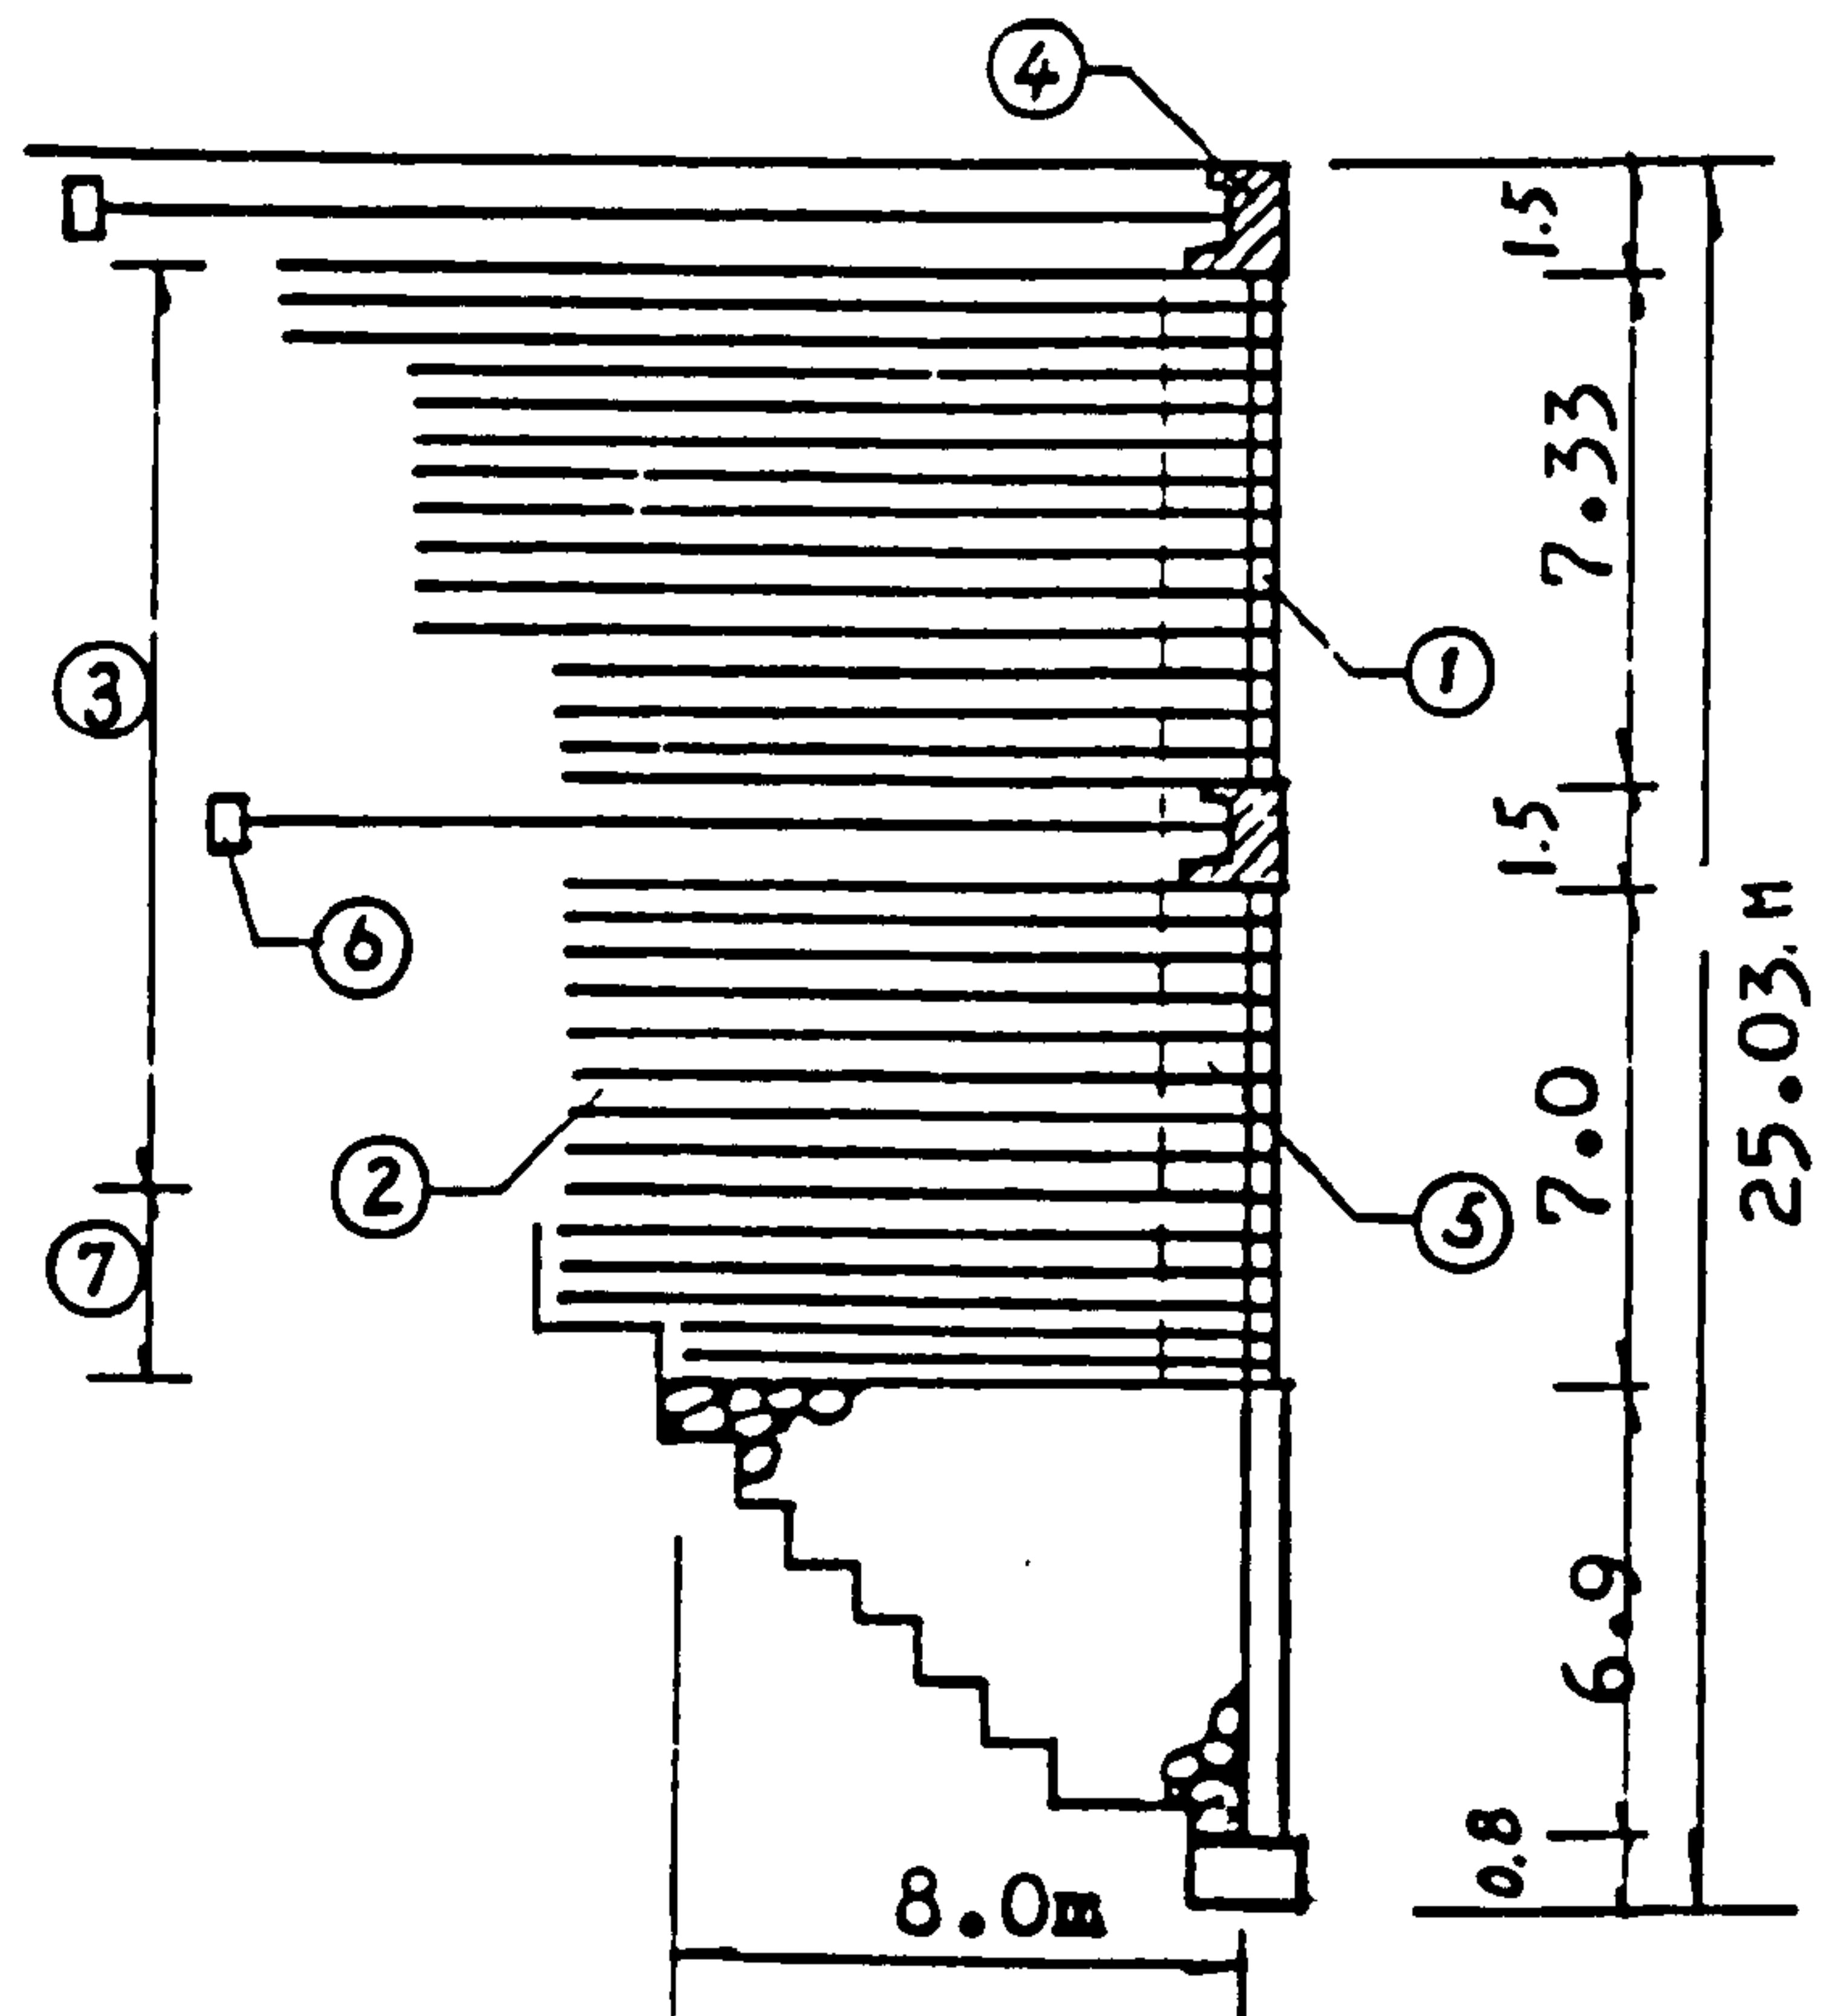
19) SECTION OF REINFOCED EARTH WALL (AFTER QUYANG, 1988).
